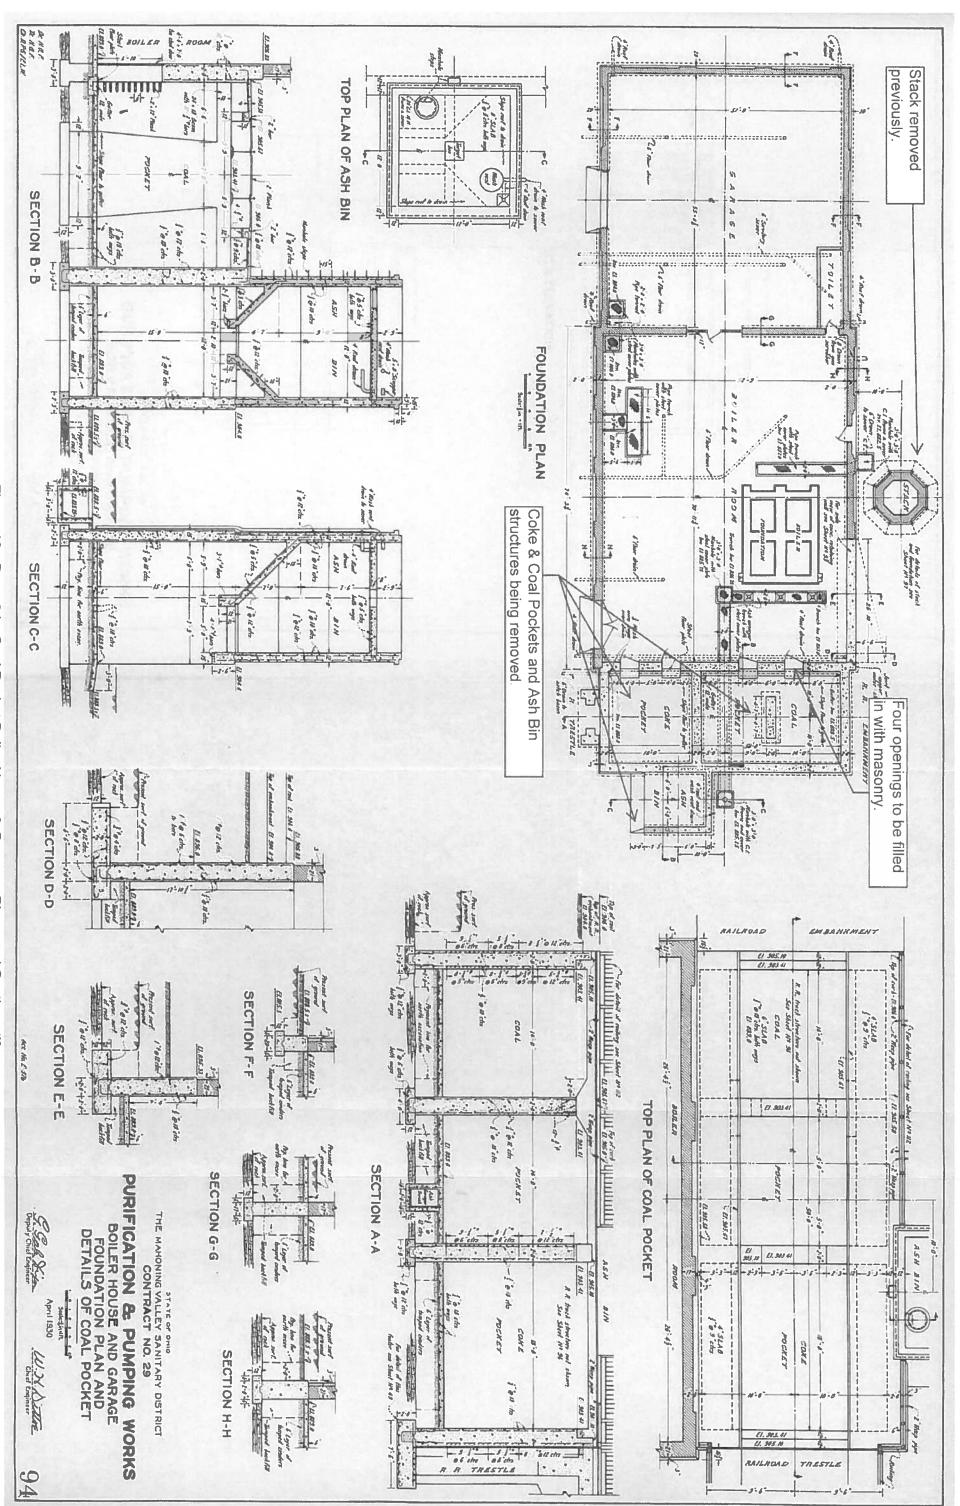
Dwg. 94 - Coal Pocket Boiler House & Garage - Plans and Sections.tif
